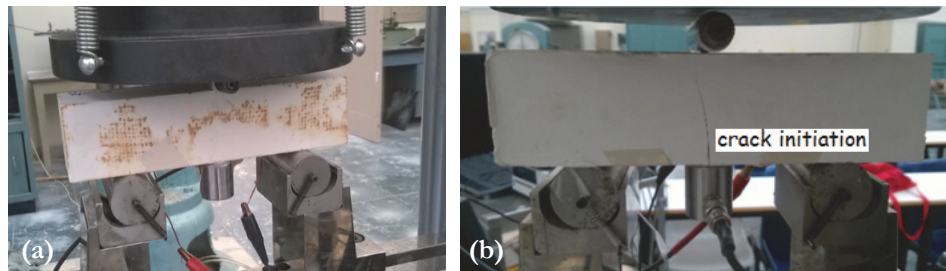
A typical test with a cement paste specimen (a) before and (b) after fracture.
